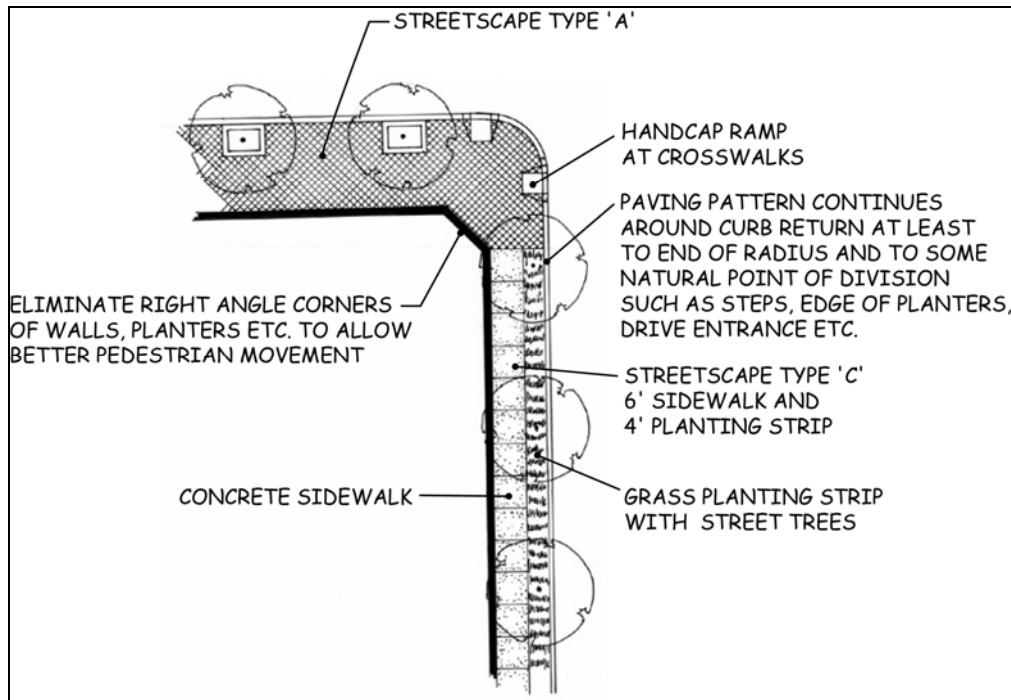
Transition from a Wider Sidewalk to a Narrower Sidewalk with Different Street Tree Treatments
